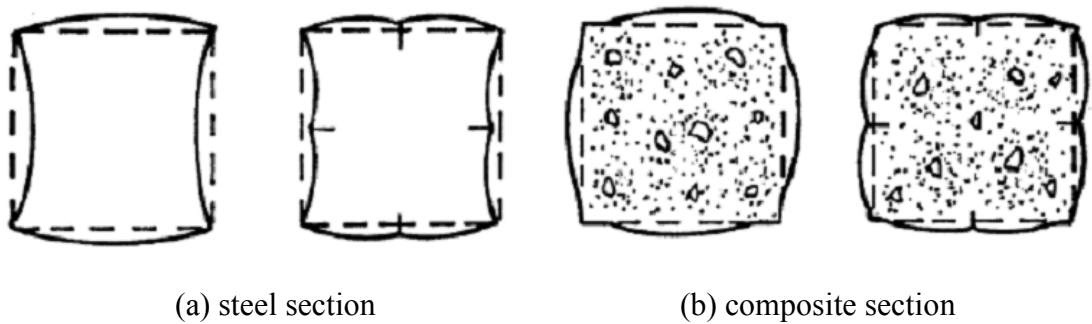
Buckling modes of steel sections and composite sections (Shanmugam and Lakshmi, 2001)
